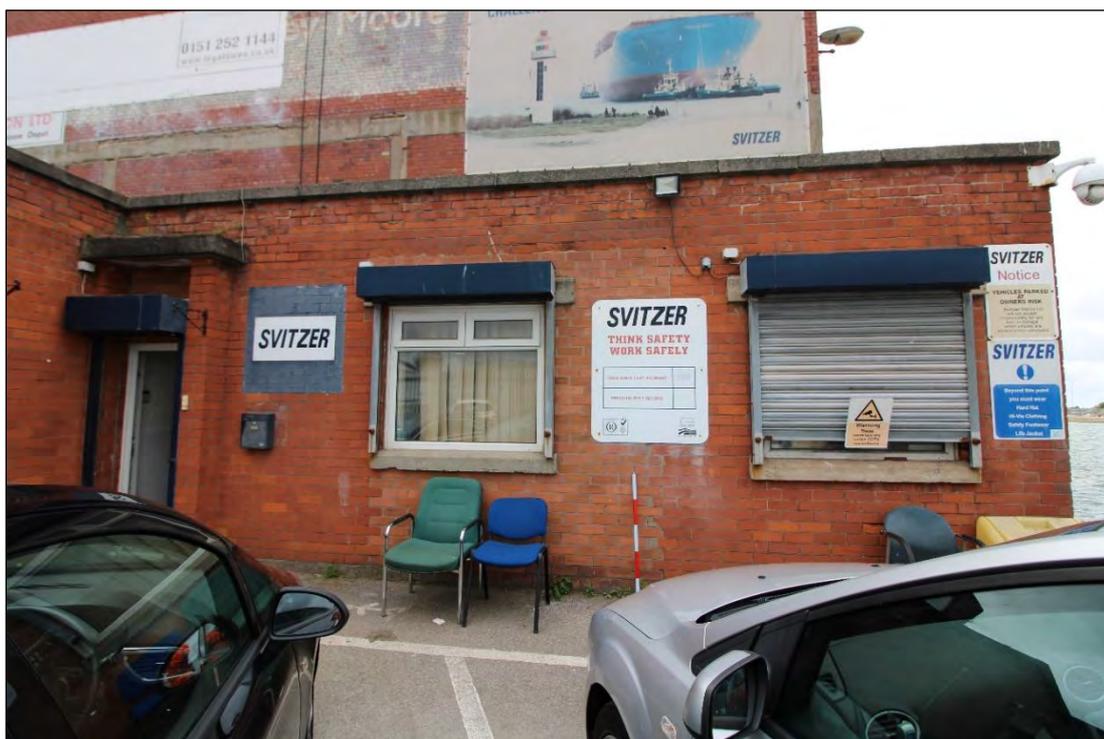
Northern half of the eastern elevation, showing infilled doorway behind the left-hand window, with 1m scale
